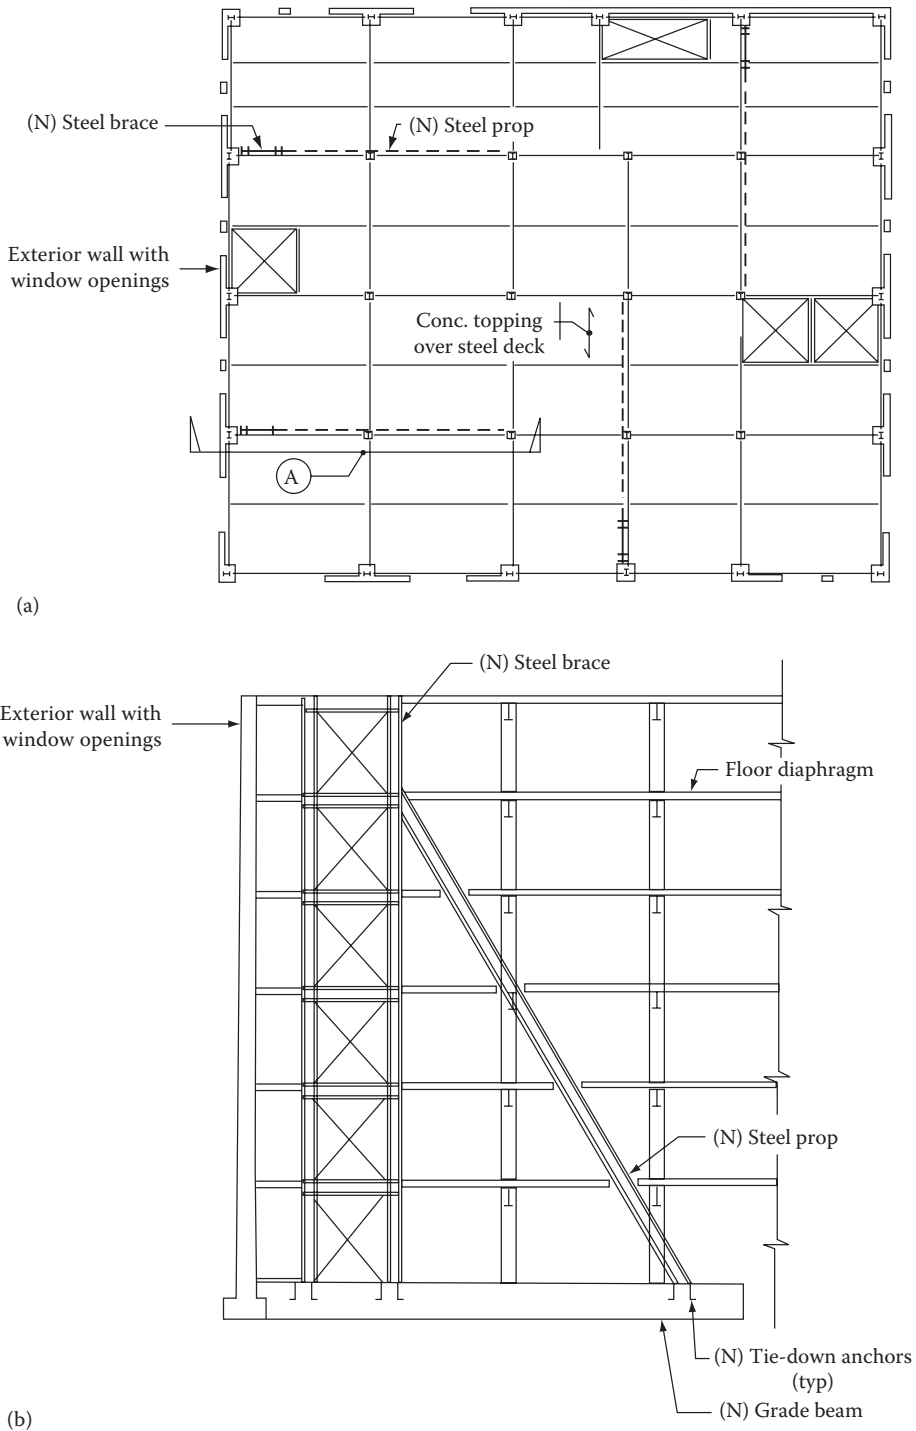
(a) Building plan showing locations of (N) steel props (b) section A; elevation of (N) steel prop.
